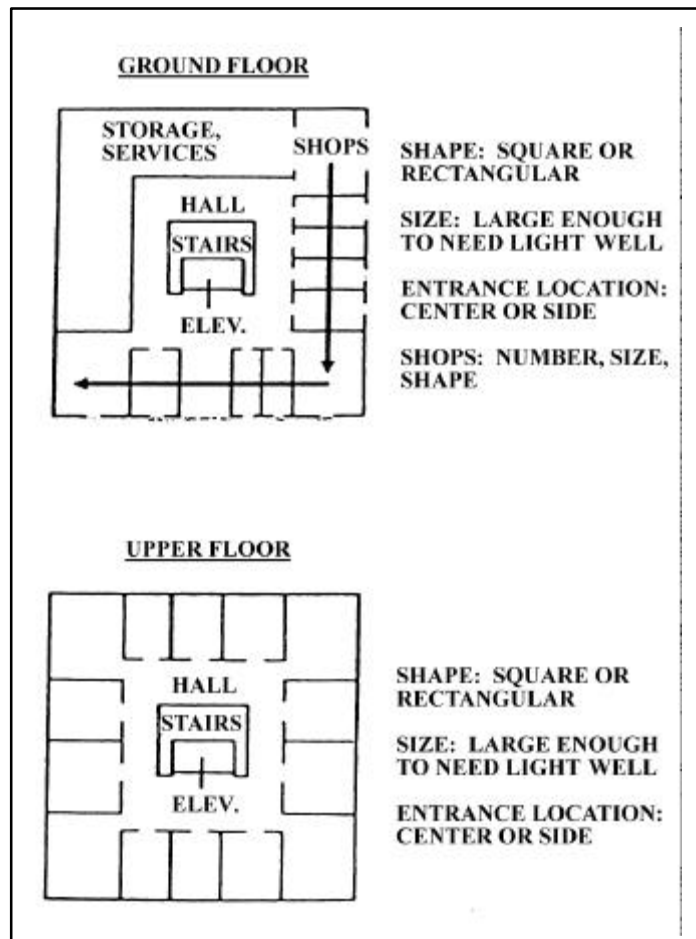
Floor Plan of Heavy-Clad Framed Office Building
